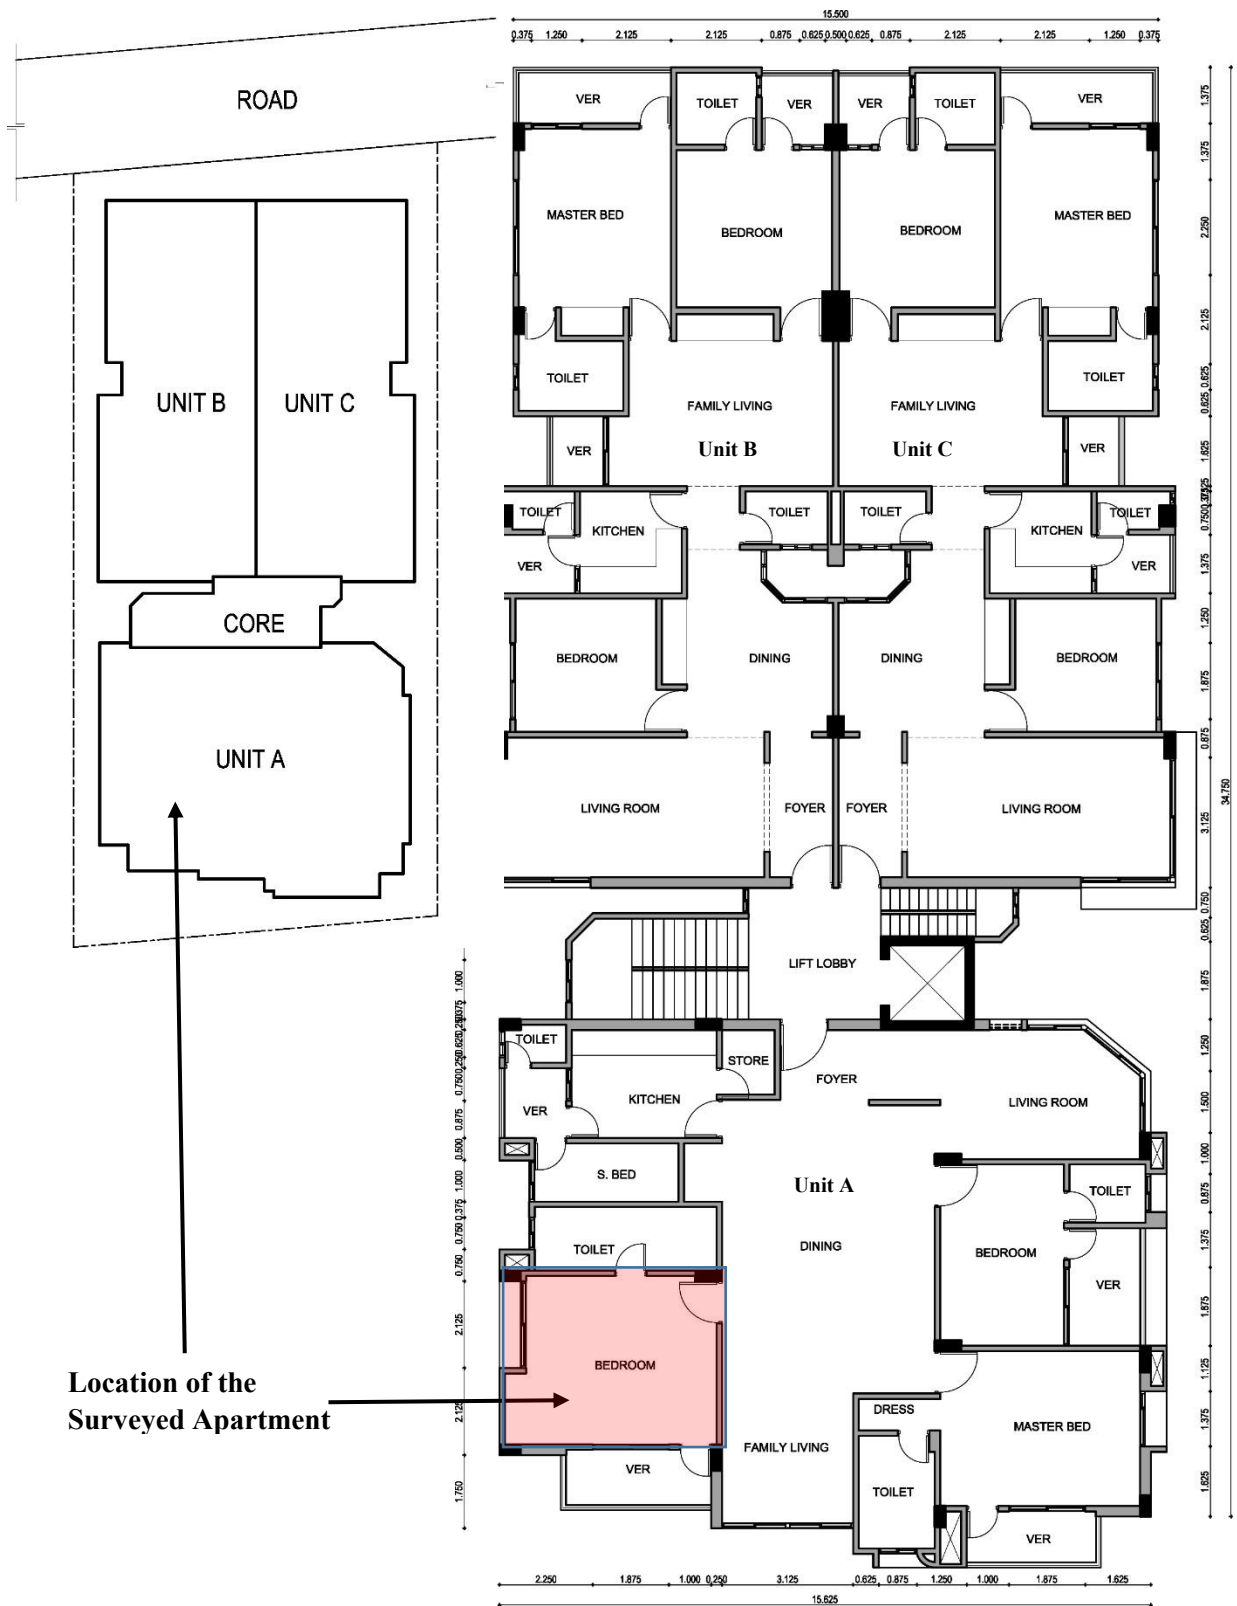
and 4.7: Unit Location and Plan of the Surveyed Building
